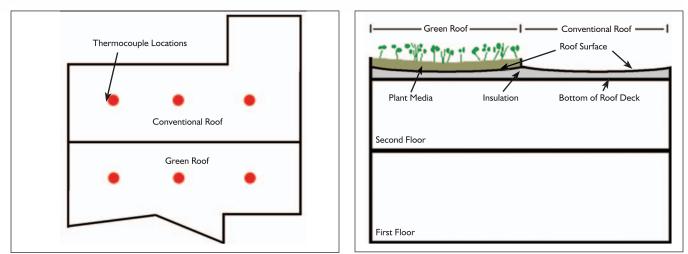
(left): Roof diagram with sensor locations. Figure 2 (right): Building section diagram.
